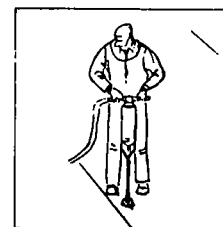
Roadway occupancy time for mudjacking one slab concrete pavement
